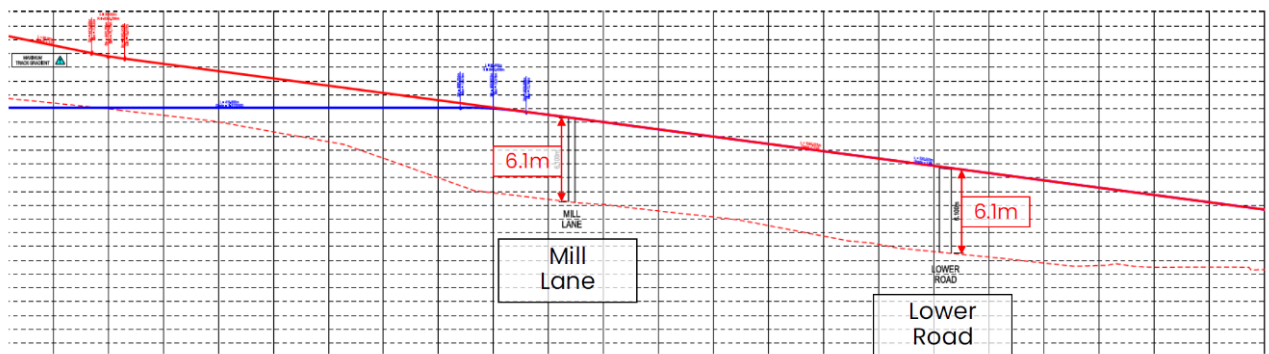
Sectional drawing: East of Cuckoo Lane to Lower Road
